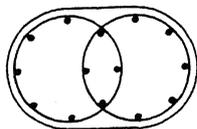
Section of a column with two interlocking spirals and longitudinal reinforcement.
